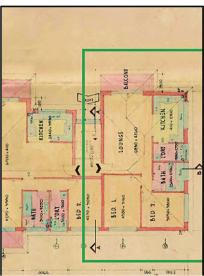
Figure B: Typical unit layout for the ground Level 1 & Level 2. Unit block is angled to the boundary and receives sun to its façade as shown in the sun eye diagrams.
